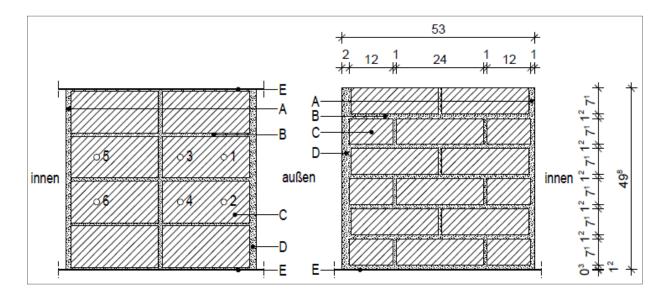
Composite wall construction; single shell masonry of traditional solid bricks during construction Left: horizontal cross section, Right: vertical cross section
